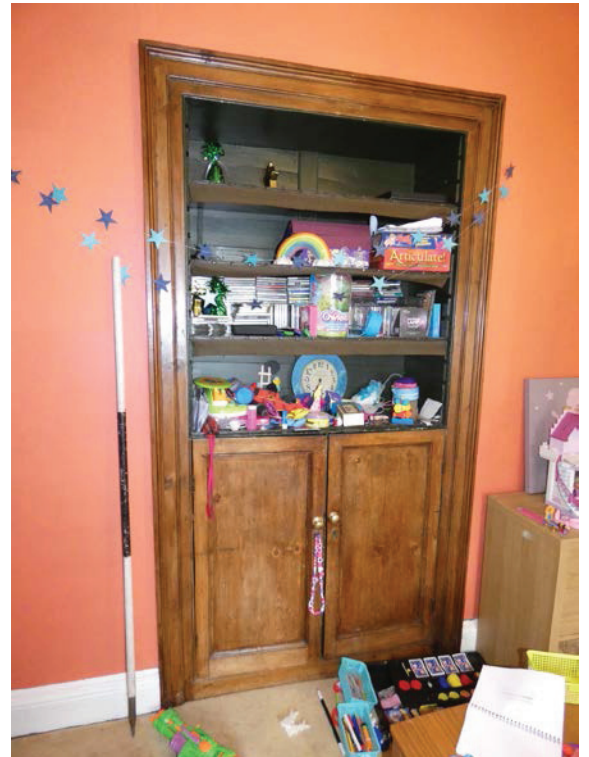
(right): The alcove/cupboard in the north elevation in Room G2, viewed from the south
